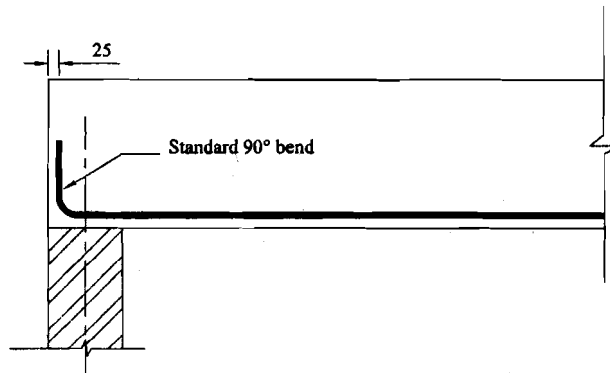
Detailing of Positive Reinforcement at End Support
